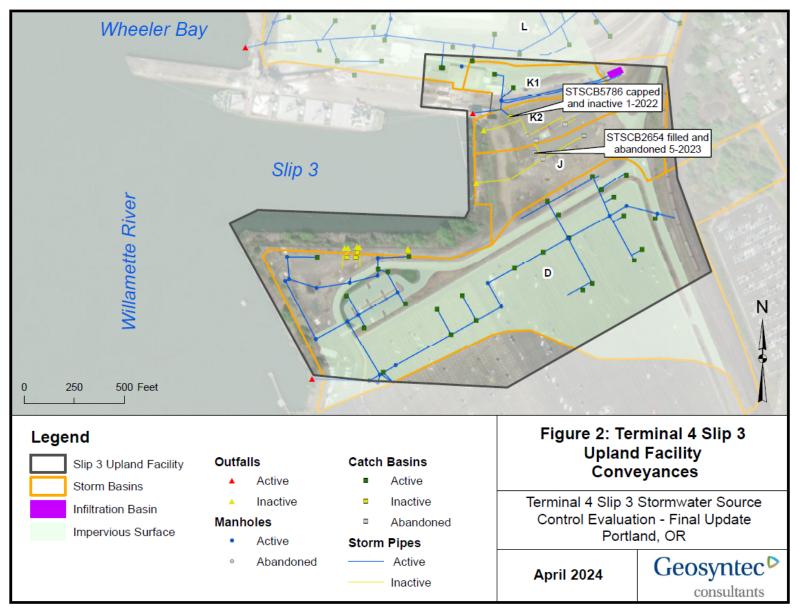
Terminal 4 Slip 3 Upland Facility Stormwater Conveyance System
